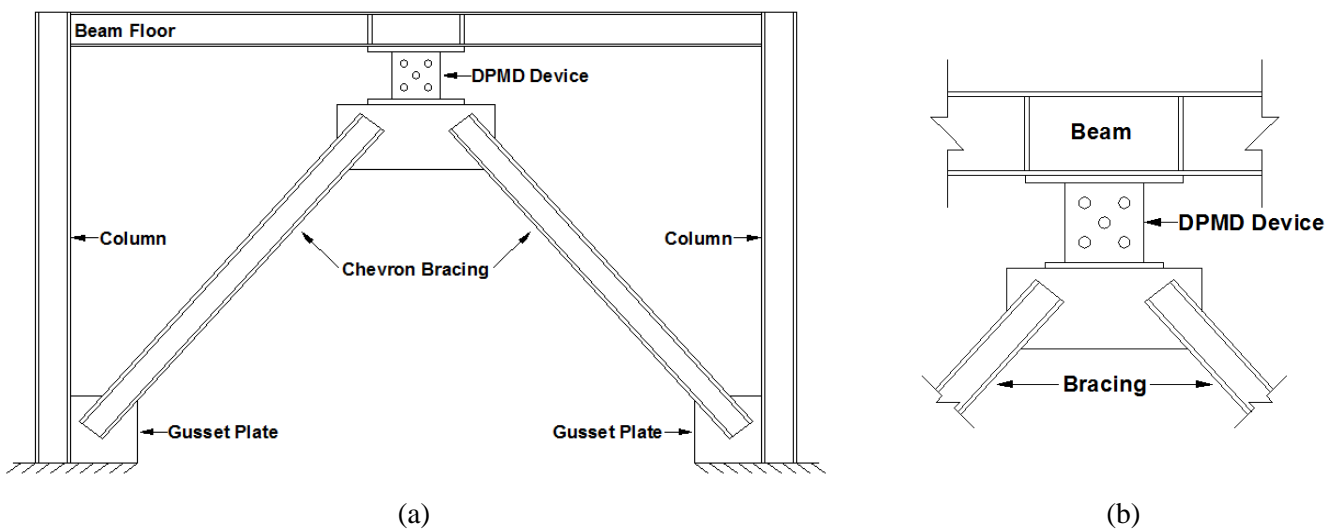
a) Frame system and DPMD position, b) Connection of DPMD to beam and bracing
